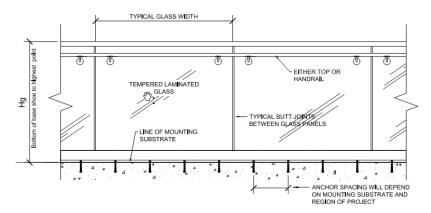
TYPICAL GLASS RAILING ELEVATION FOR SURFACE MOUNTED GUARD RAILS IN CONCRETE
